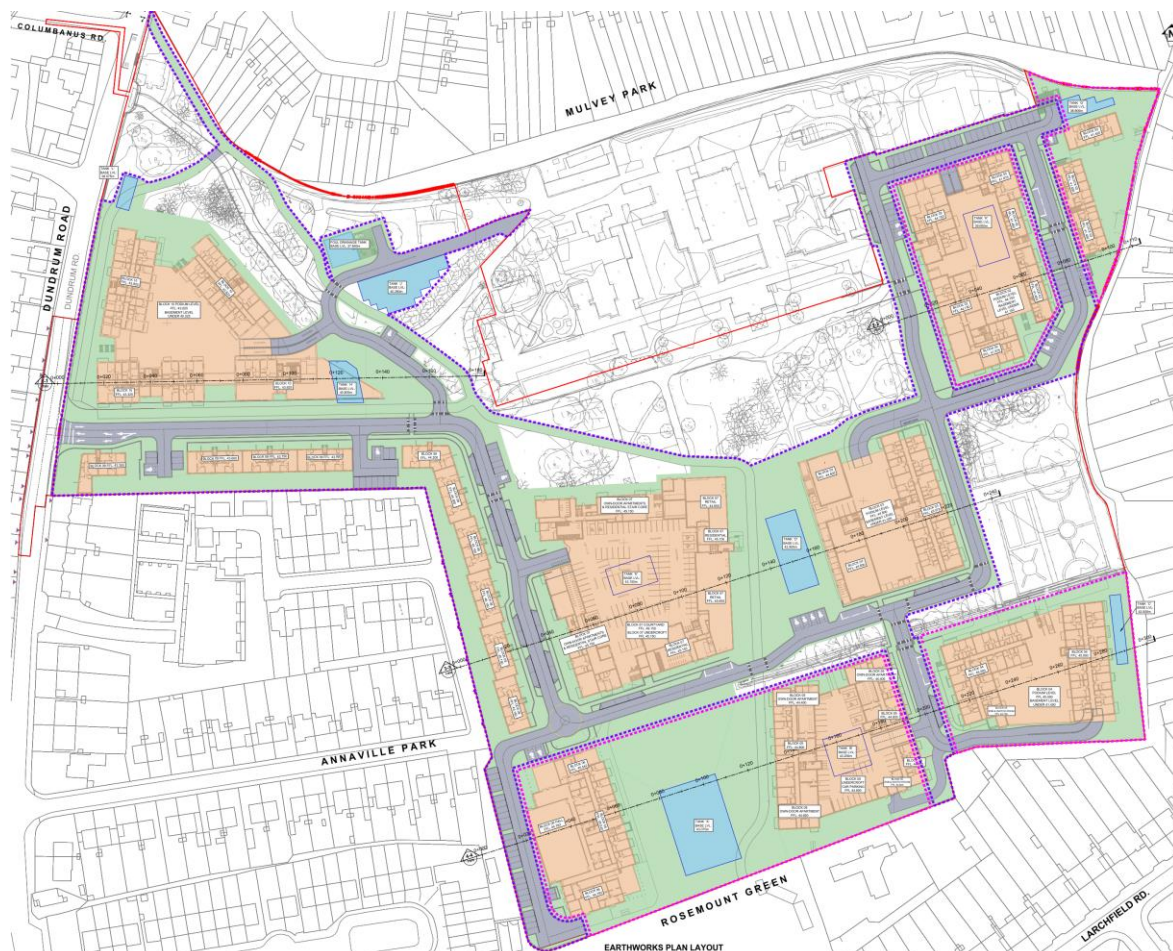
Extract from BM earthworks drawing based on Civil-3D modelling of the cut and fill earthworks on site
